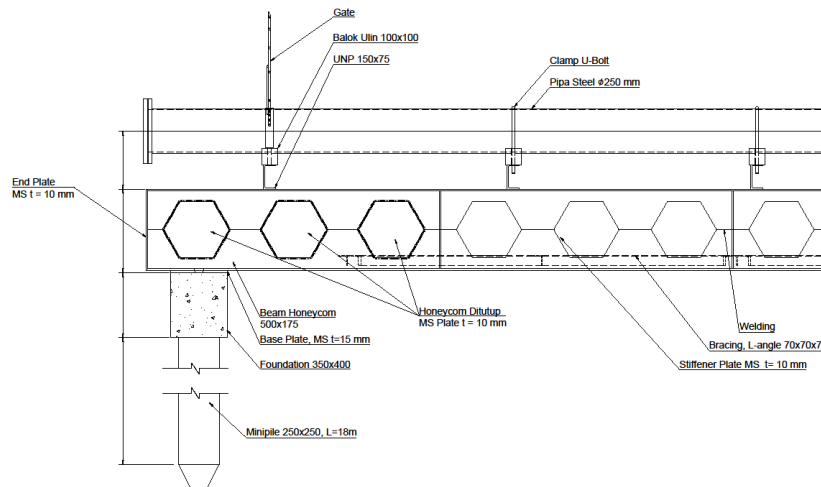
Abutments Section (Source: CV Elza Jaya Prima)
